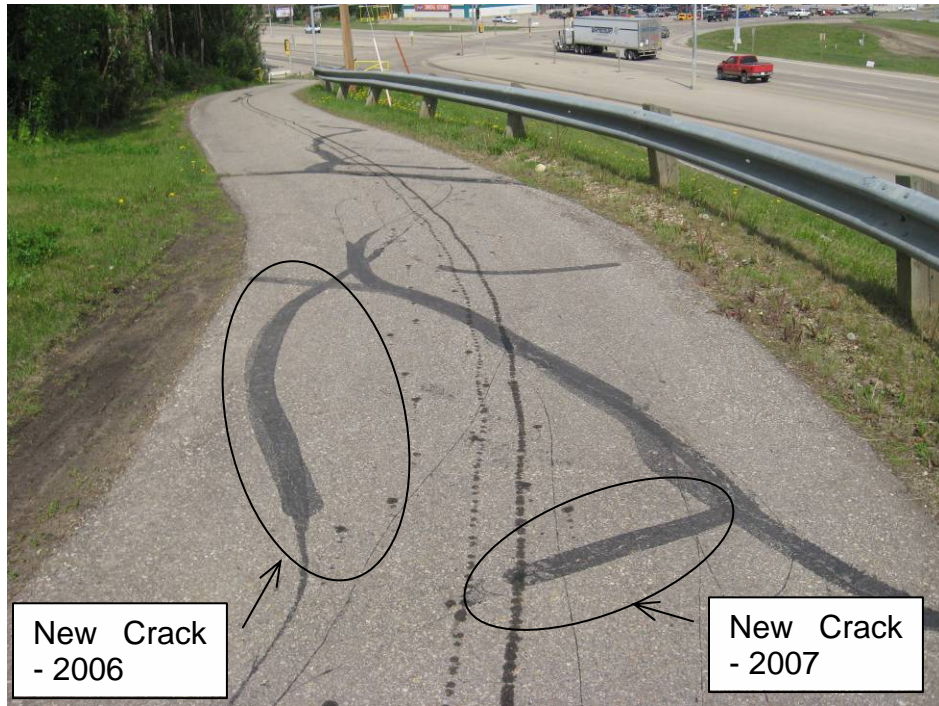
Closer view of new crack to south of existing cracks, June 11, 2008.
